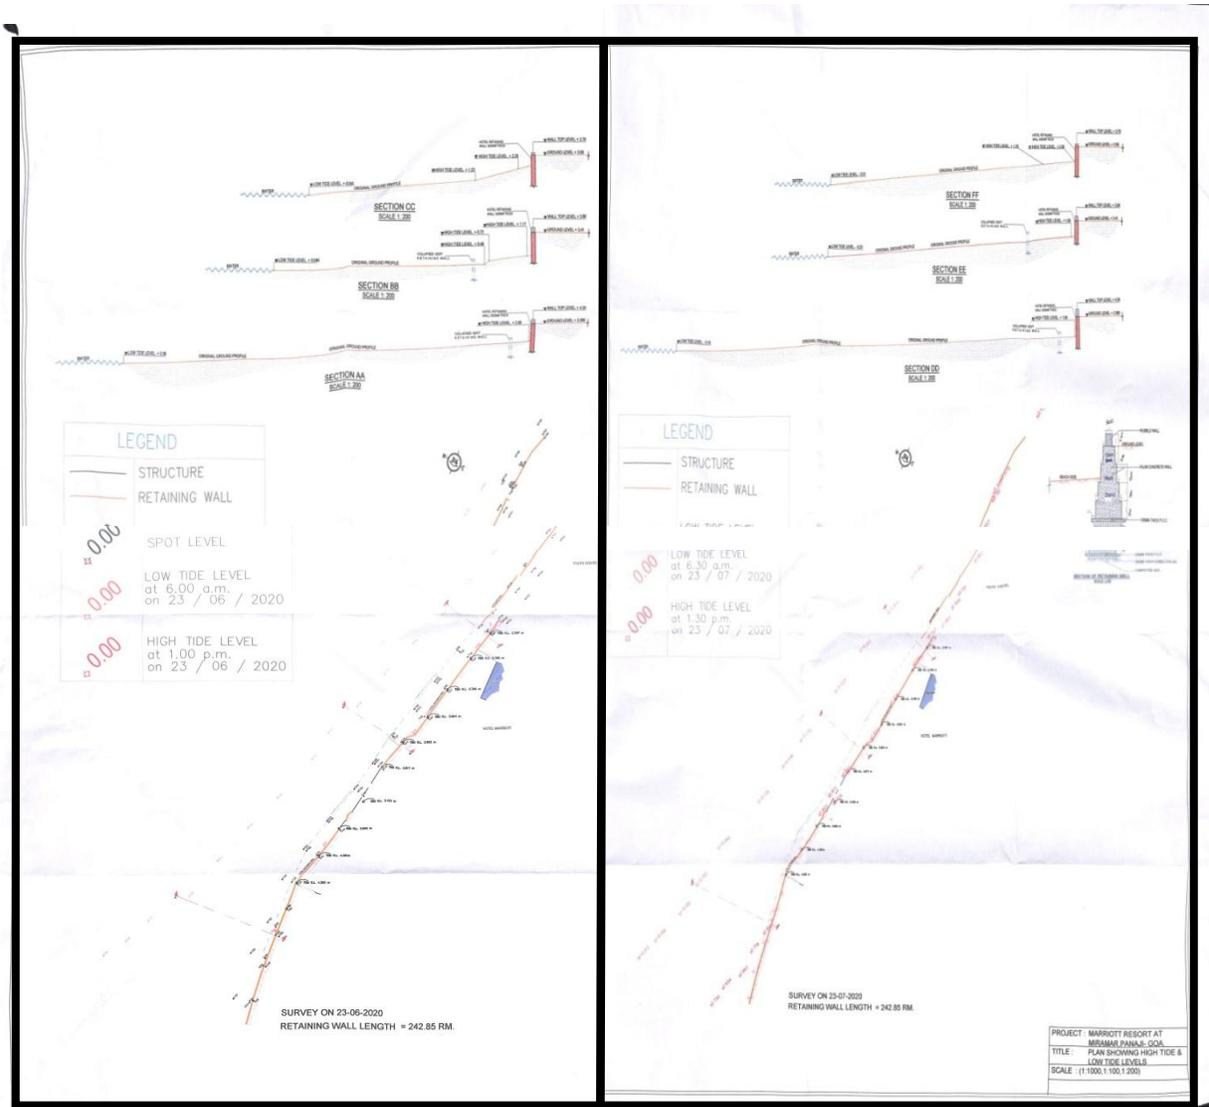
Plan showing High, Low Tide Levels and Top Level of Wall
